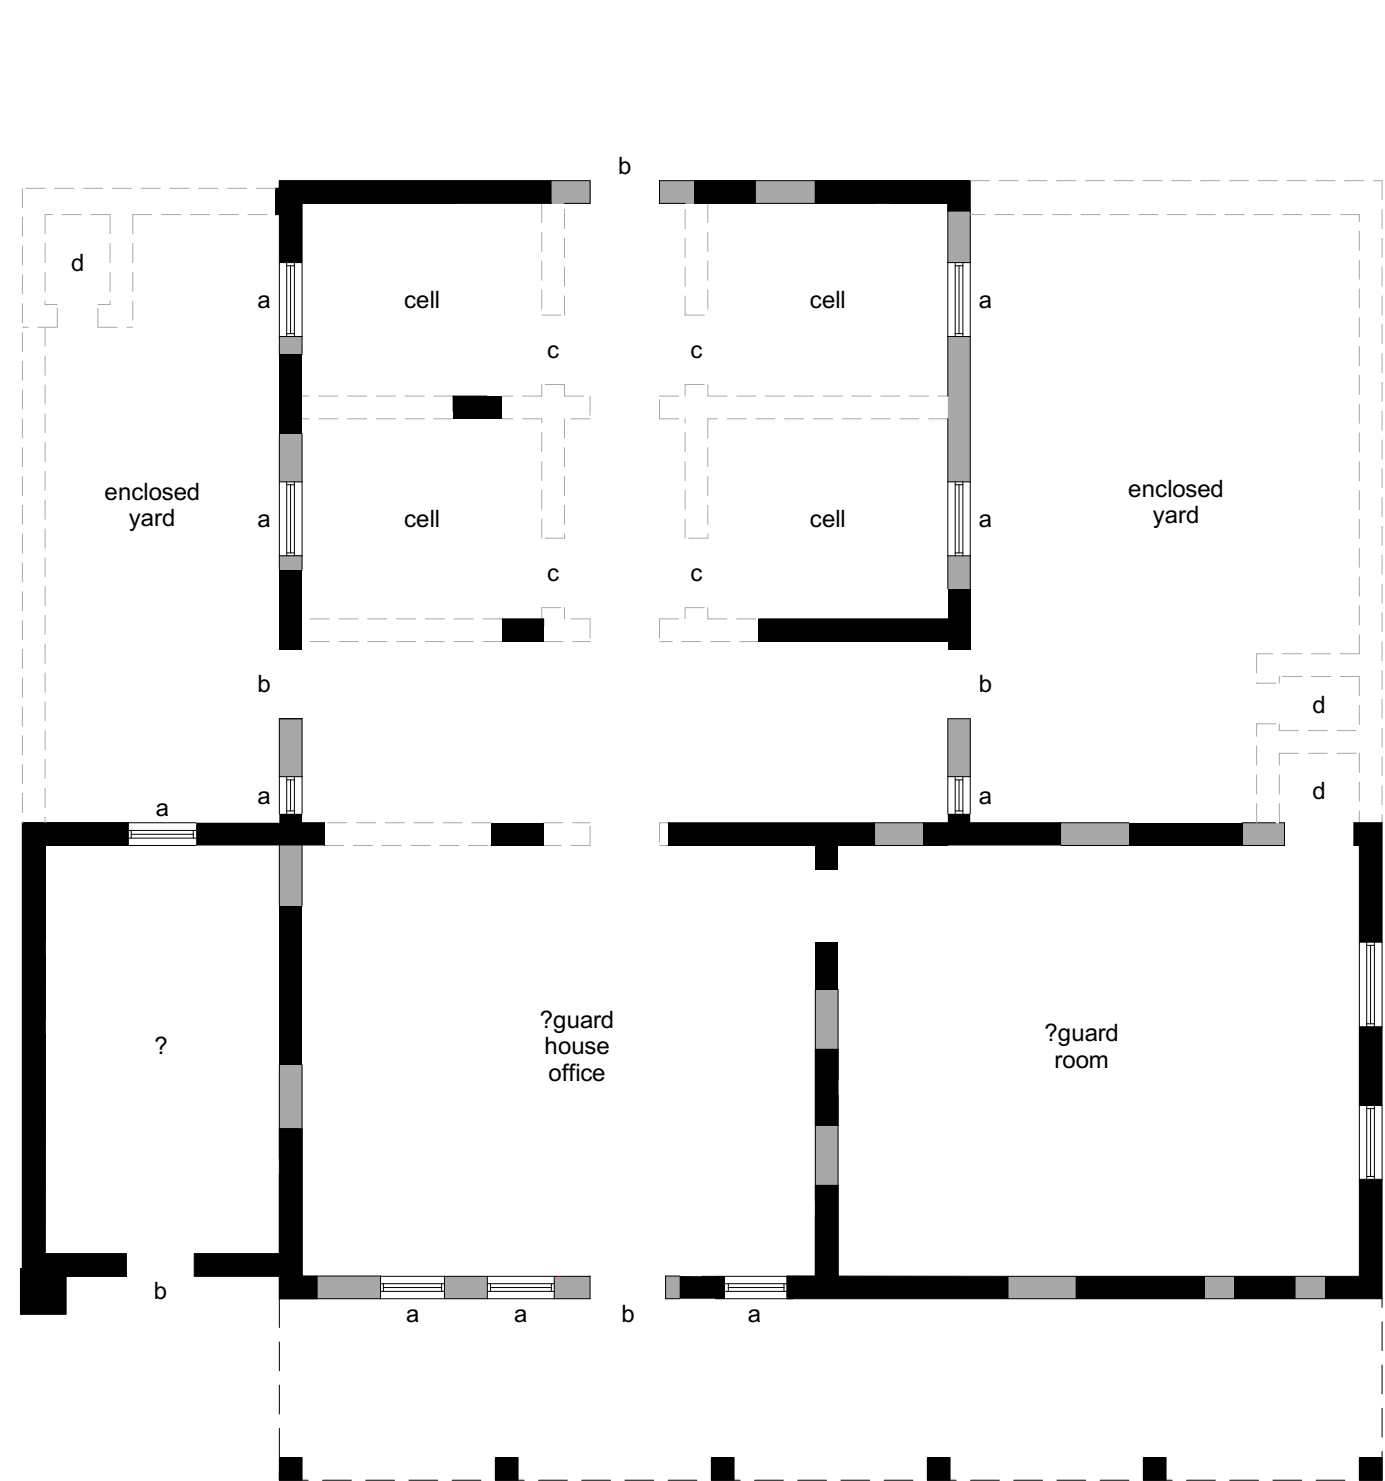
MEE 03: original floor plan of the former Meeanee Barracks Guard House, with surviving fabric shown black and removed/altered components shaded grey.
